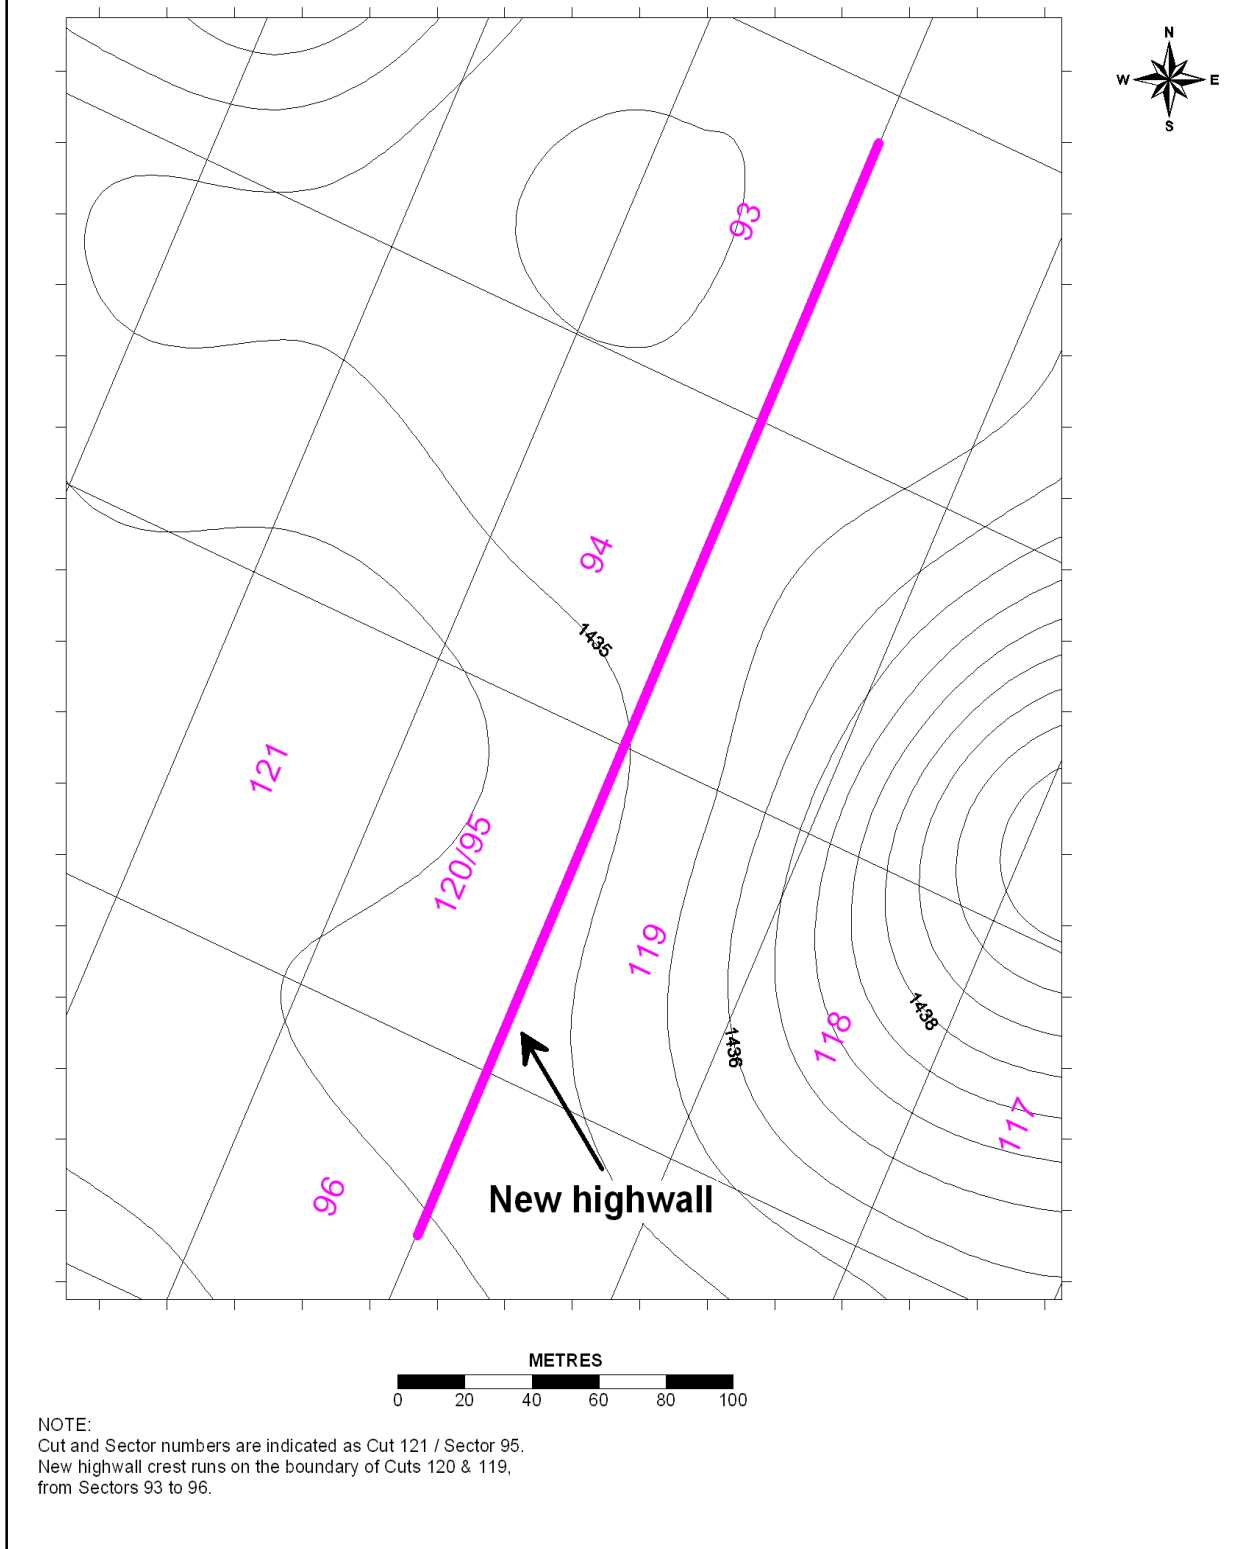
West Pit test site, New Vaal Colliery
